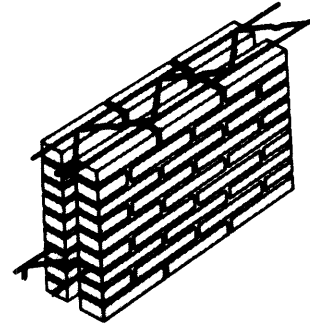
Some methods for reinforcing concrete masonry walls. (Courtesy of Portland Cement Association)
